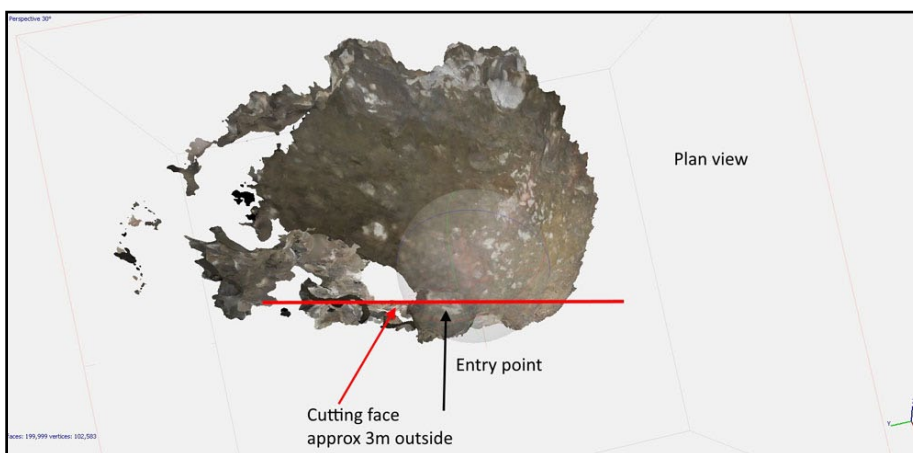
Photogram cut through pipe and void. The plan view is roughly 3–5 m round.
